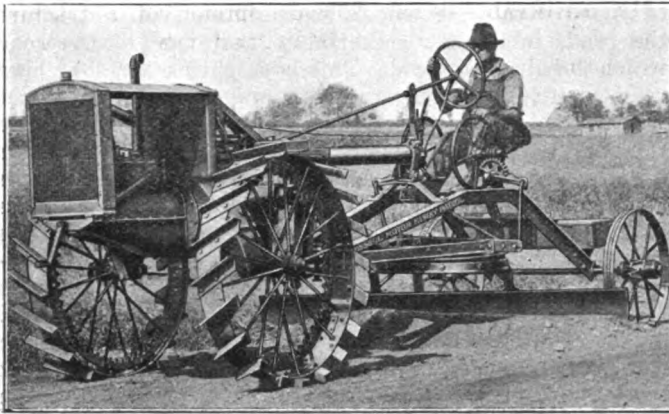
A 6-FT. MAINTENANCE MACHINE THAT IS EMPLOYED FOR HIGHWAY PATROL DUTY
